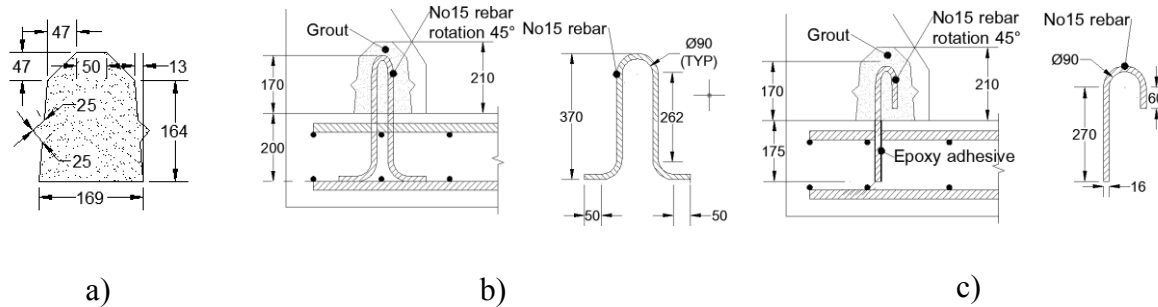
Anchorage systems, a) Recess dimensions, b) U-shape rebar connection, c) stud rebar connection
